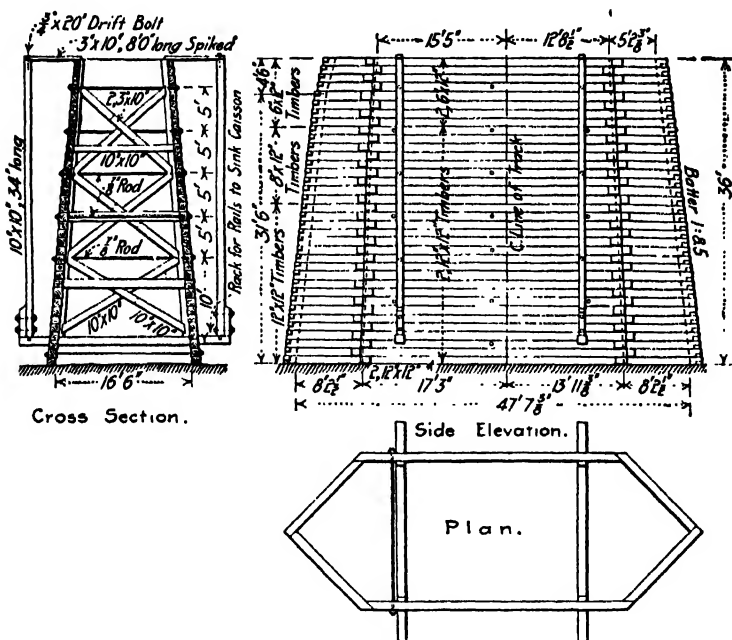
Open Caisson for Piers of Oregon-Washington Railroad and Navigation Company over Columbia River.
